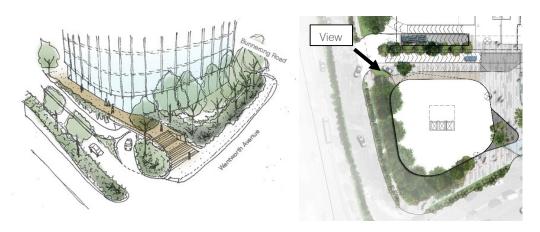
Indicative 3D and plan view of pedestrian access to the west of Building B
